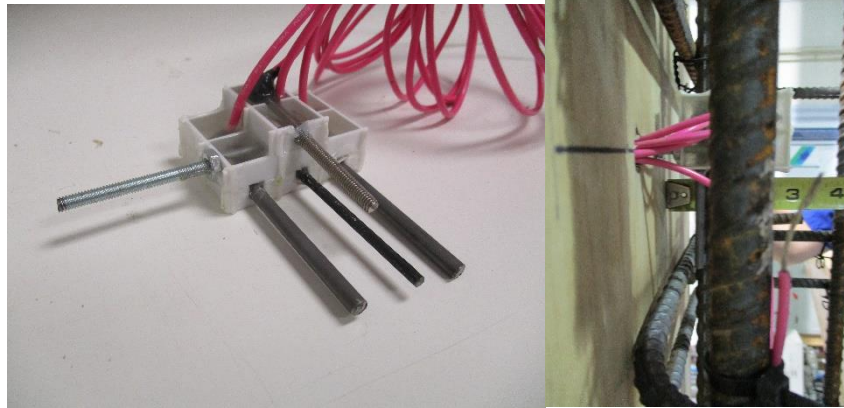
Corrosion sensor. Left: General view. Right: Installation in concrete column specimen formwork.
